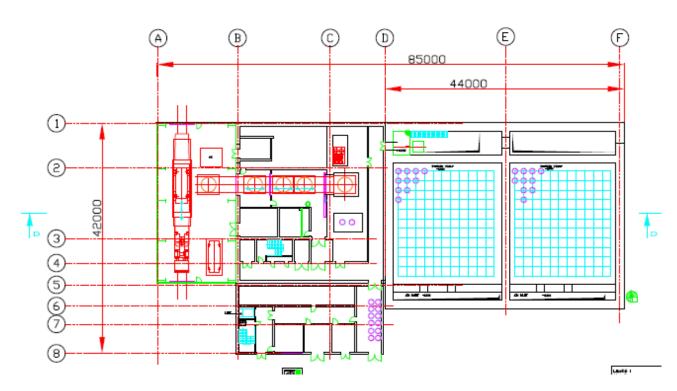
VAULT STORAGE BUILDING - PLAN VIEW
